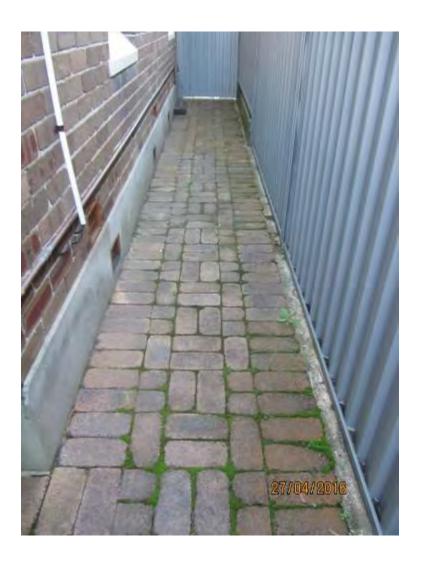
shows typical condition of the brickwork and mortar to the eastern elevation
